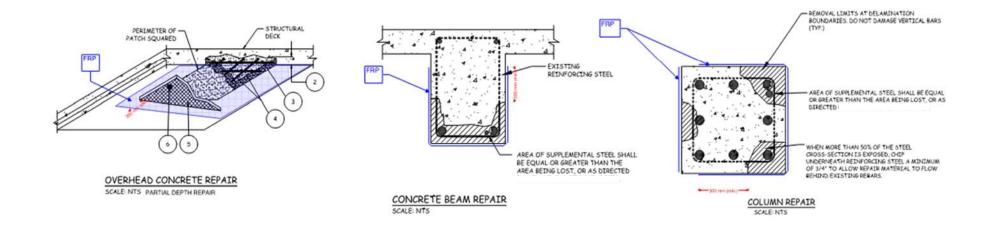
Details typical underside (soffit, girder, beam) repair techniques by way of crack injecting, concrete chipping and form and pump concrete.
